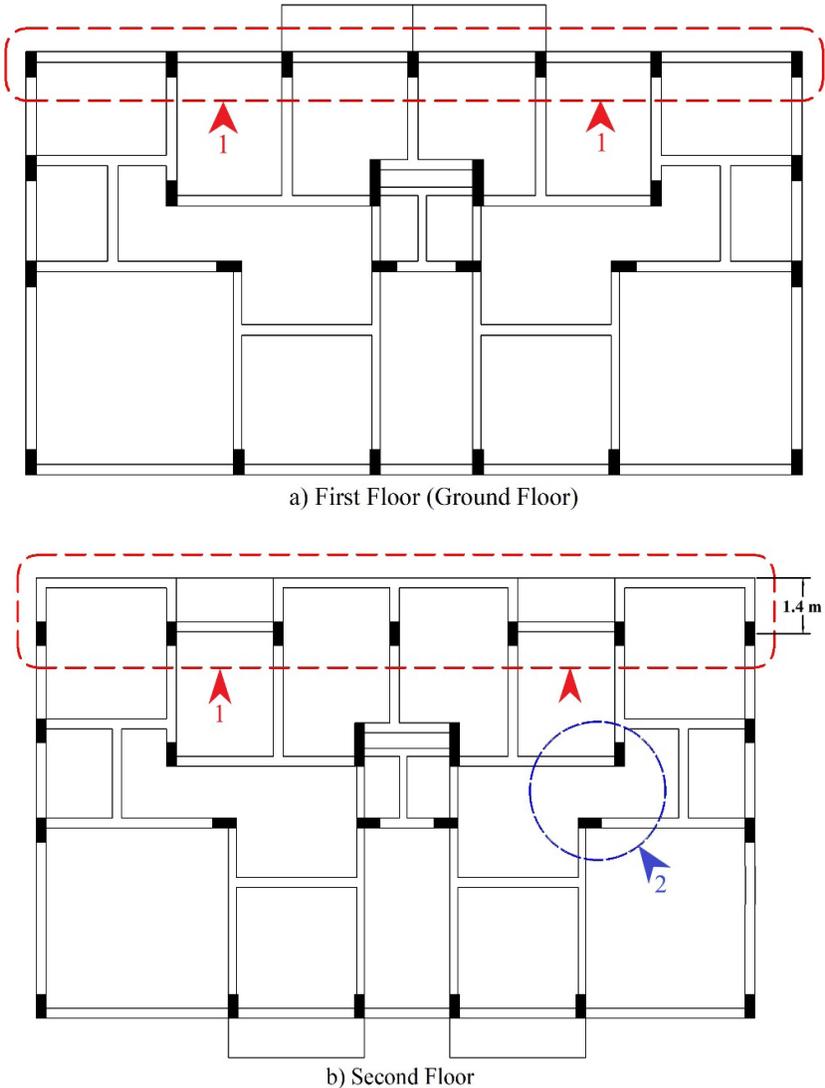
An Example of an Overhang, a) First, and b) Second Floor Plan
